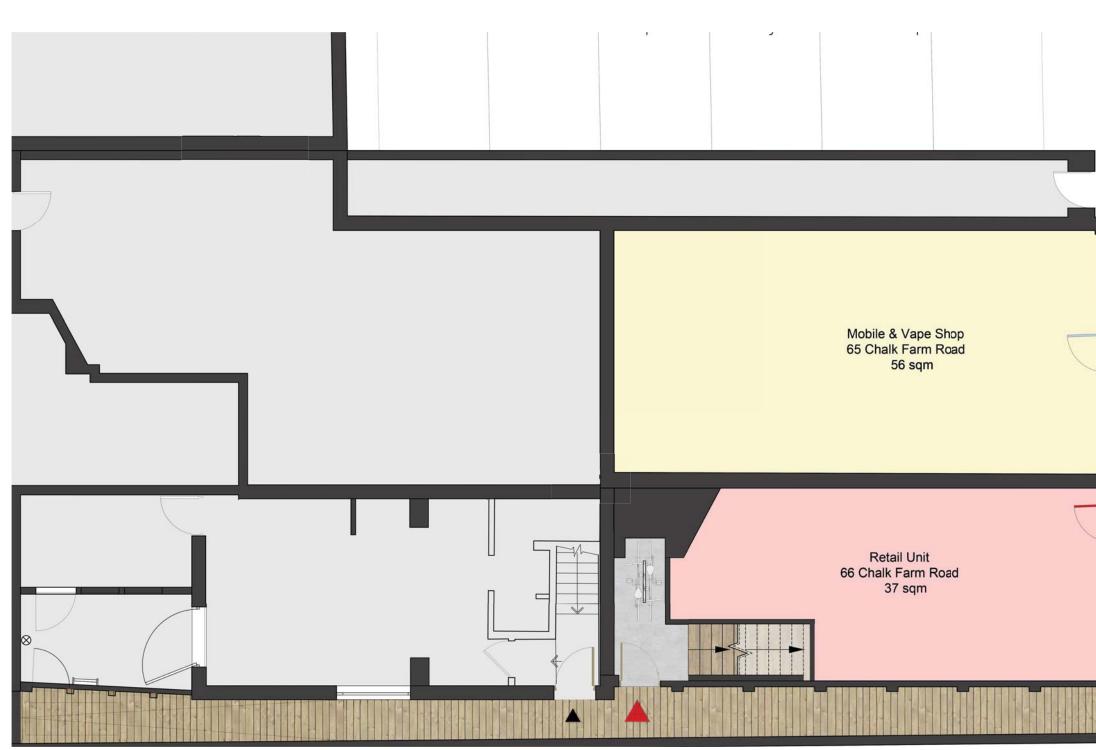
Ground Floor showing access to proposed flat via side entry and new stair
